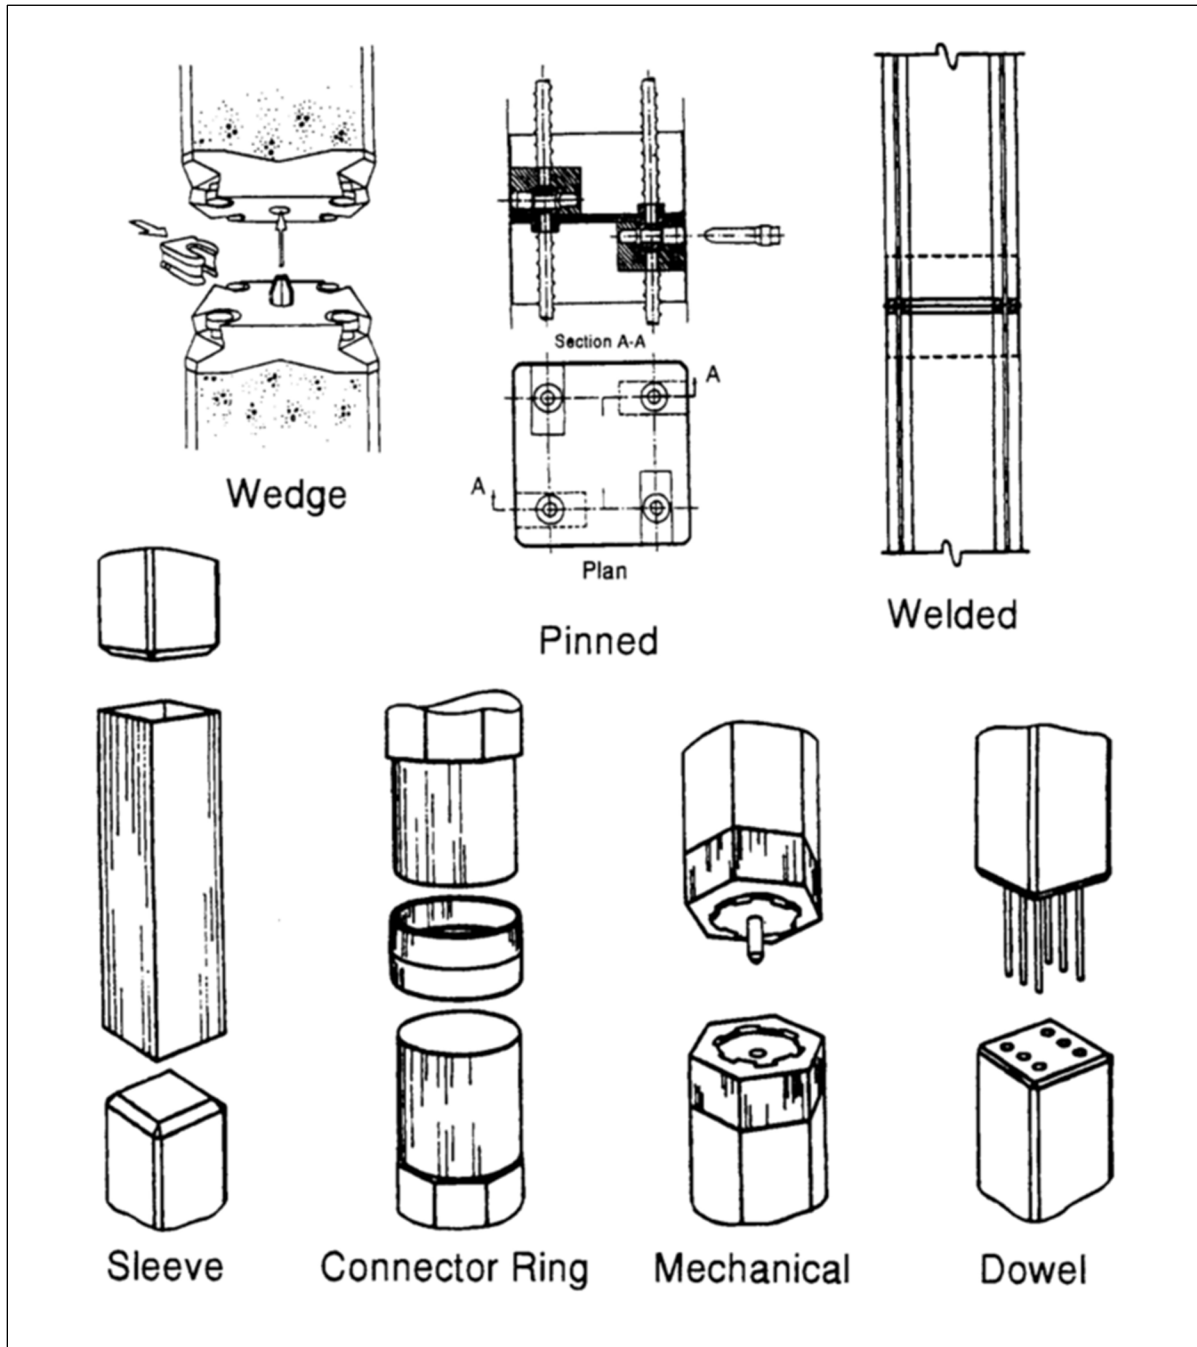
Commonly used prestressed concrete pile splices (after PCI 1993).
